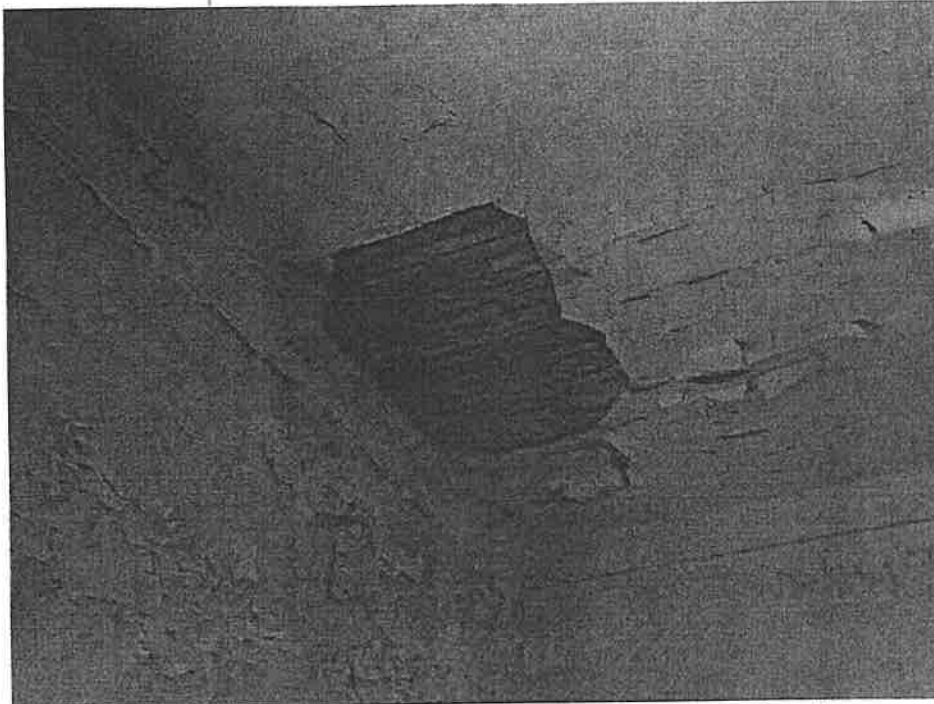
Failed, delaminated and moist plaster at 2nd Floor ceiling and walls. Note water damaged, deflected wood lath.
